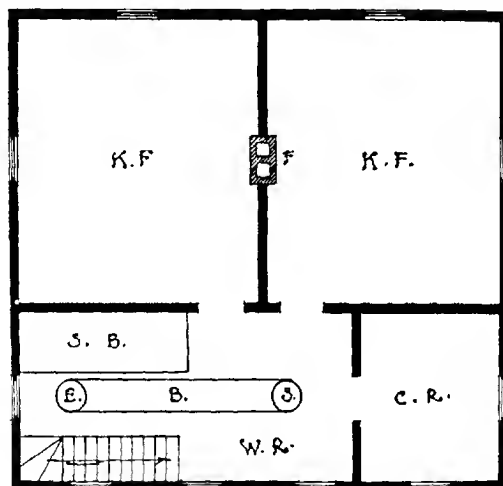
Fig. II.—Two-kiln Evaporator, Second Floor Plan.
